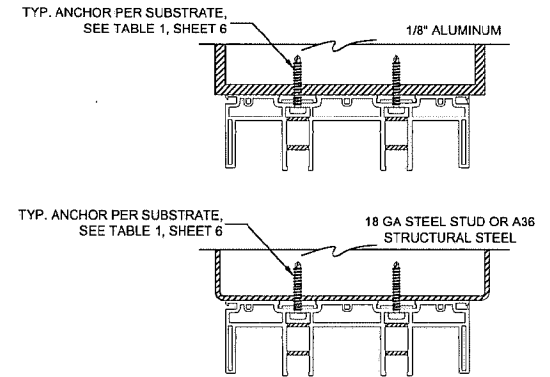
DETAILS APPLY TO 2, 3 AND 4 TRACK CONFIGURATIONS. SEE SHEETS 2-4 FOR ANCHOR LOCATION & SPACING.
